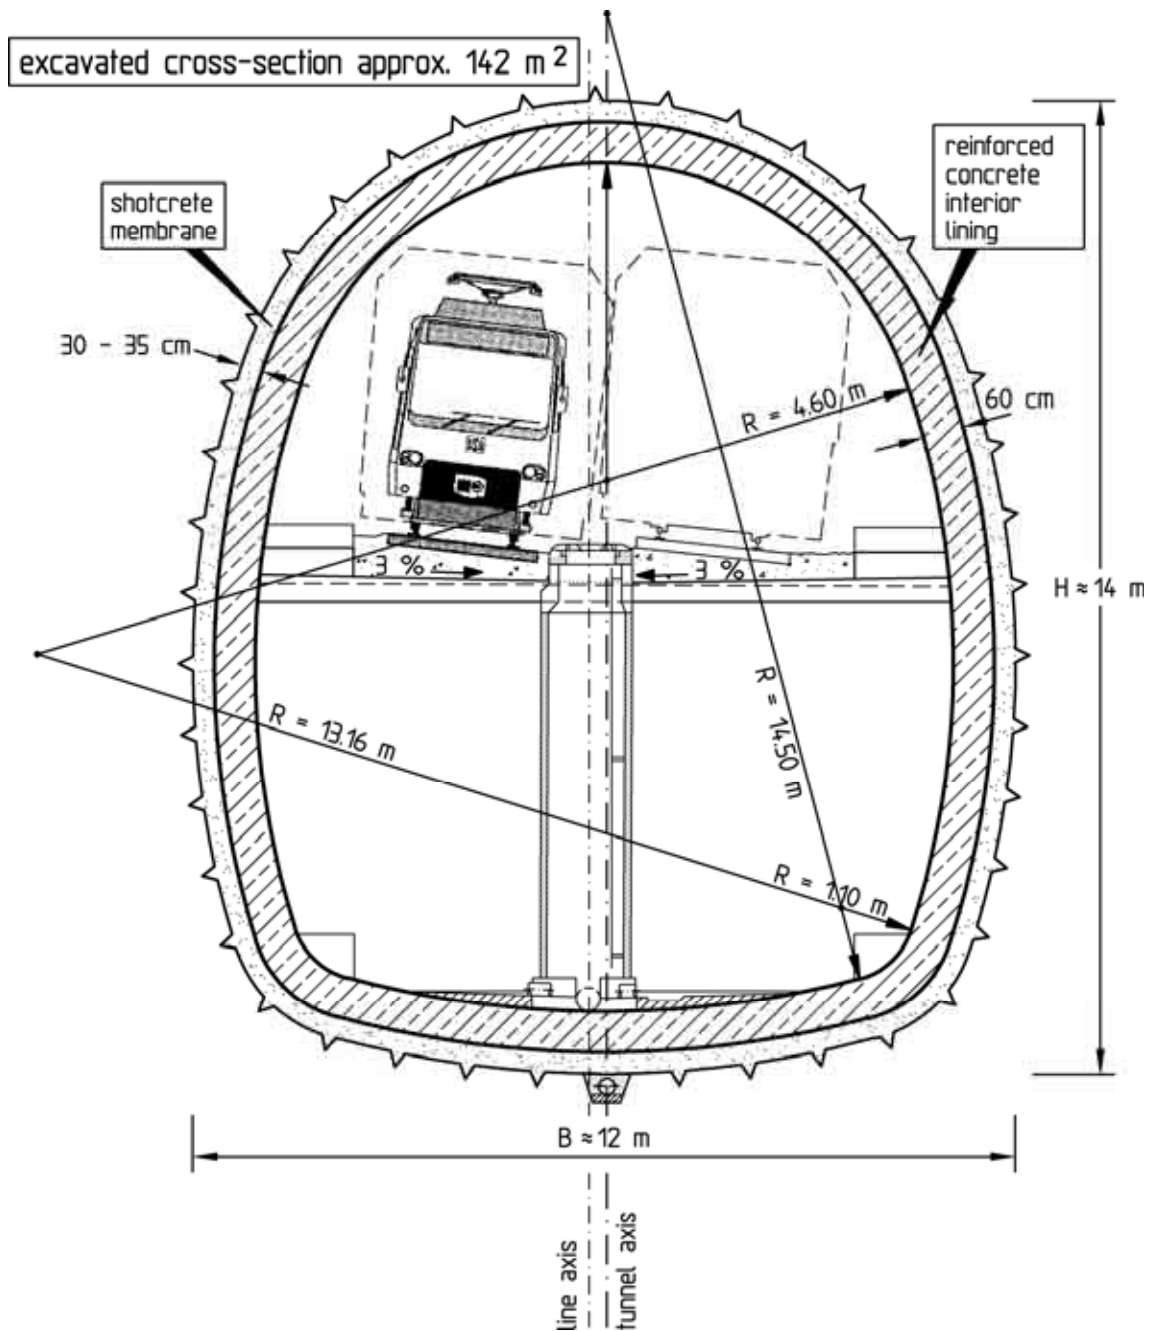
City railway tunnel to Botnang, maximum cross-section (km 4+239.5)
